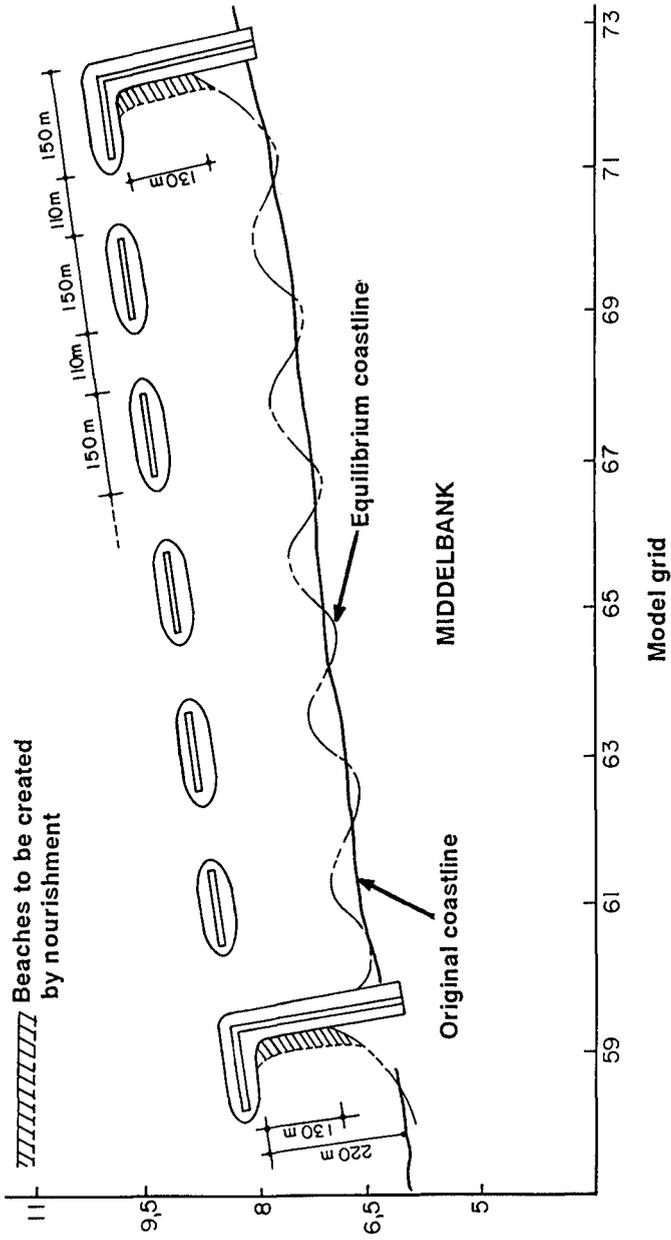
A PROPOSED LAYOUT AT MIDDELBANK
